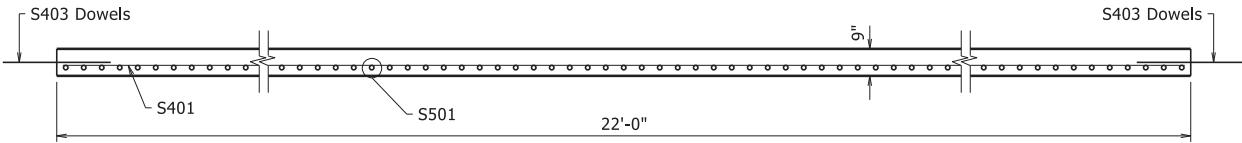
DETAILS OF LONGITUDINAL CONSTRUCTION JOINT
